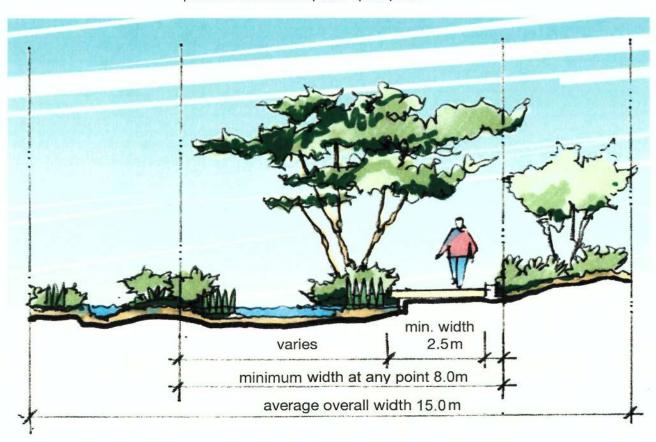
Illustrative Section across Internal Greenway (Illustrating key dimensions)
